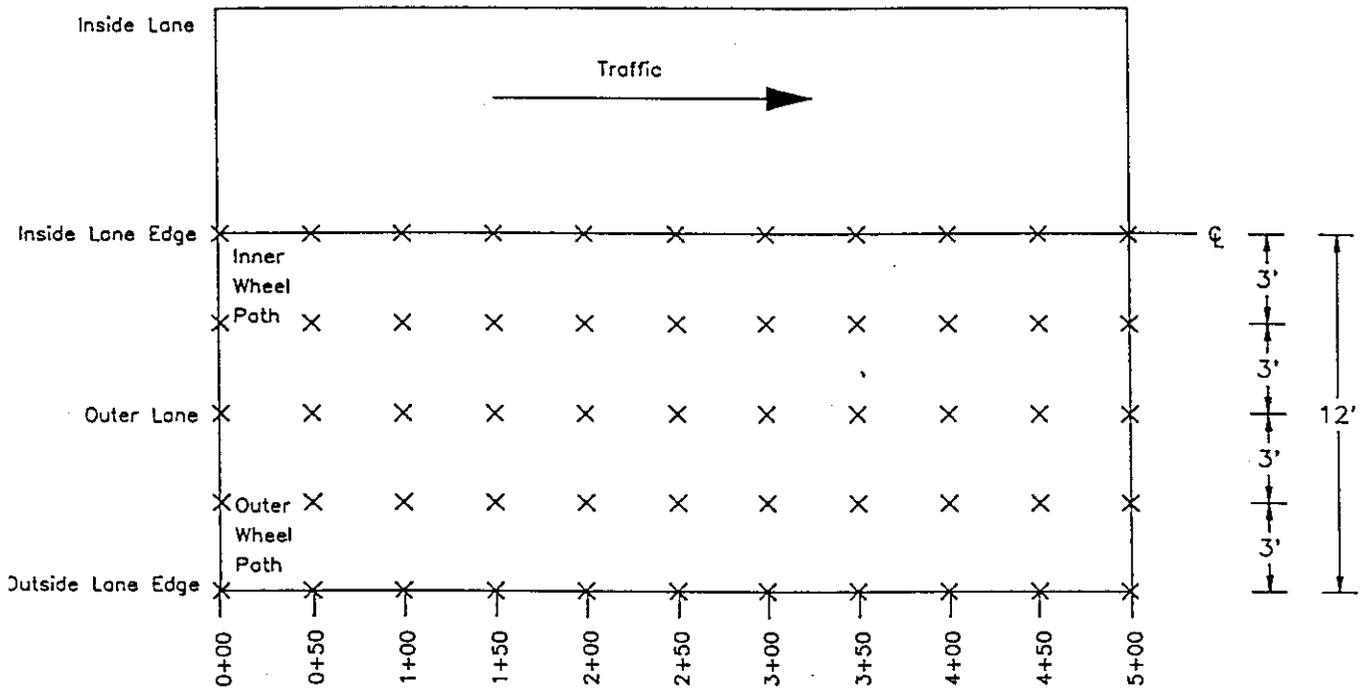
Test section elevation measurement location for SPS-1 Montana.
